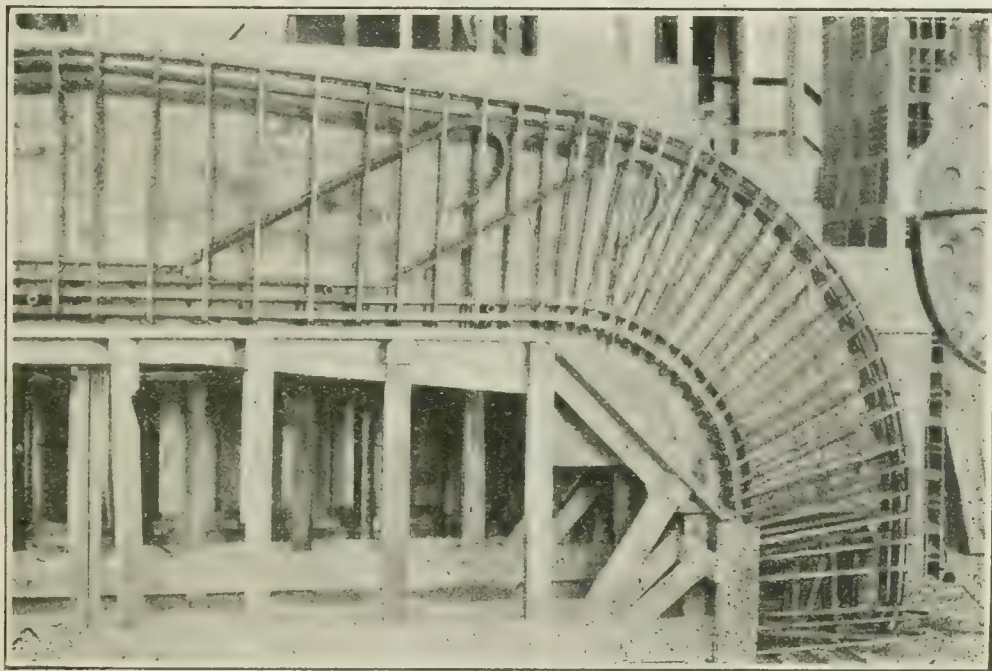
VIEW OF REINFORCEMENT USED IN SHIP FRAME SPECIMEN.
